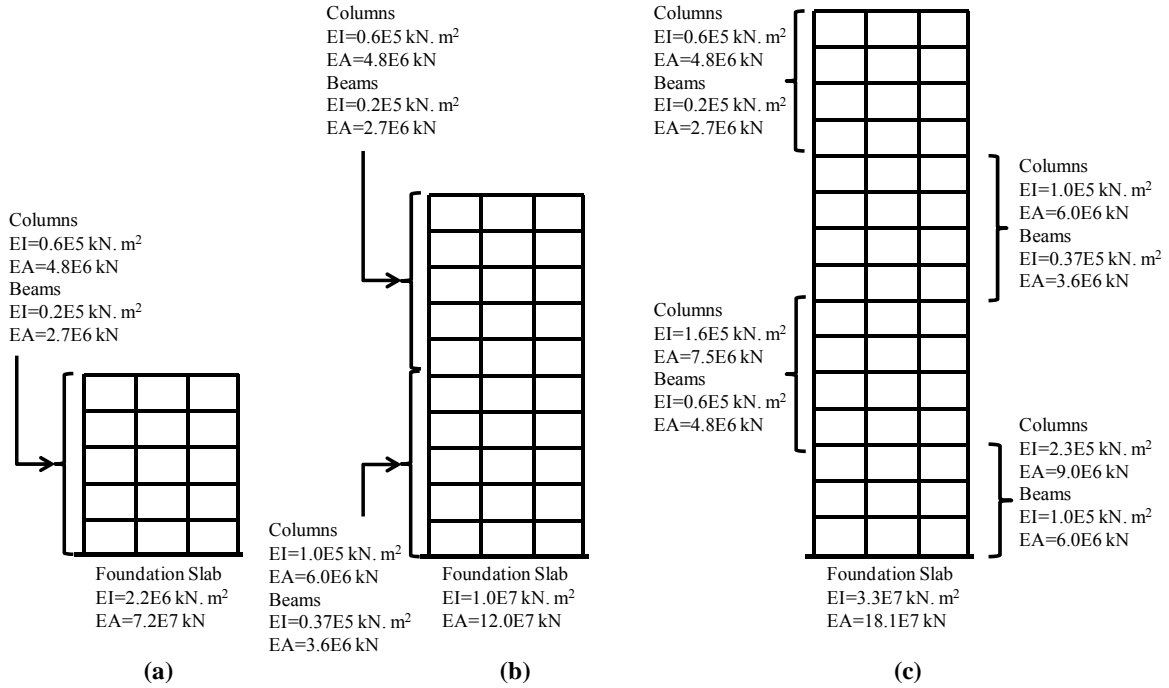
Concrete sections designed for the adopted frames based on inelastic design method; (a) 5 storey model (S5); (b) 10 storey model (S10); (c) 15 storey model (S15)
